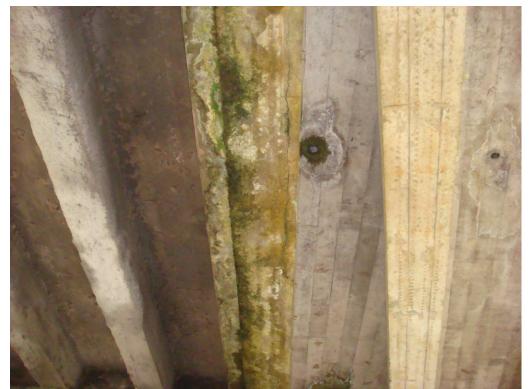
DELAMINATION AND HAIRLINE CRACK (8' LONG) IN BOTTOM OF GIRDER G5
